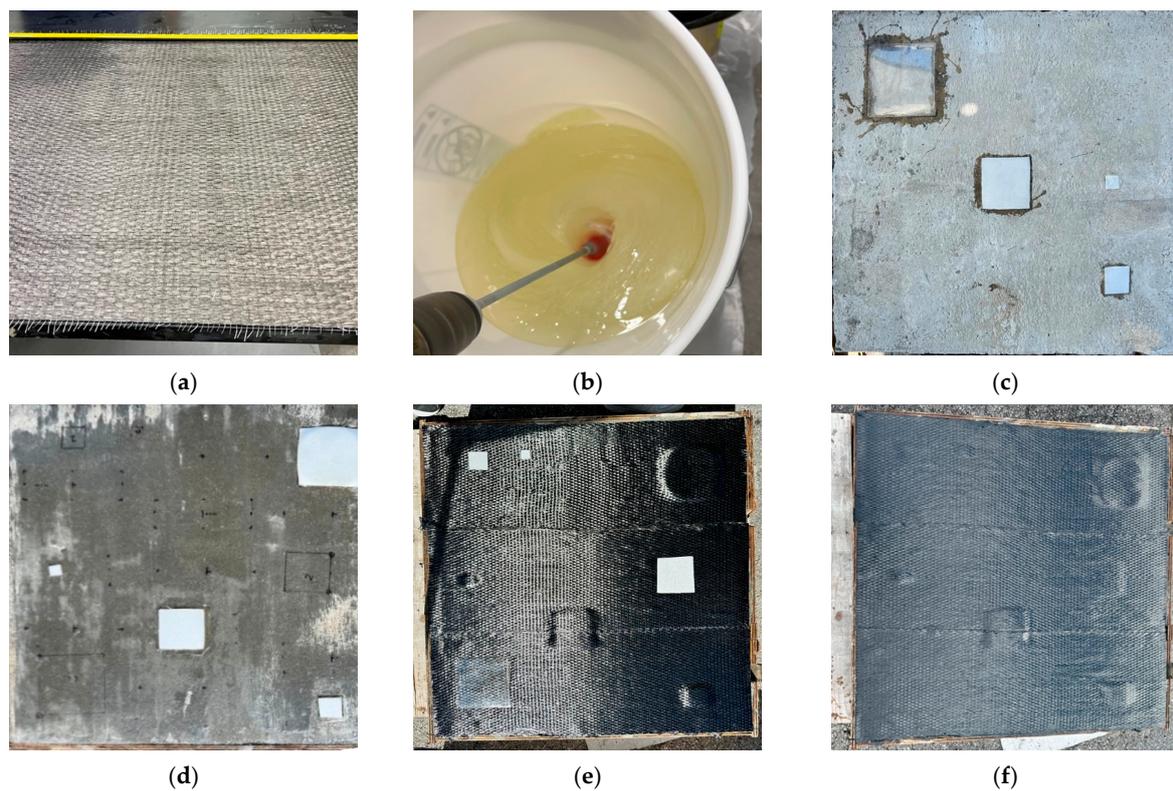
Defects generation in EB-FRP concrete elements. (a) Unidirectional CFRP sheet, (b) mixing of the resin, (c) adhesive–concrete debonding, (d) surface impregnation, (e) first layer of CFRP, (f) strengthened slab.
